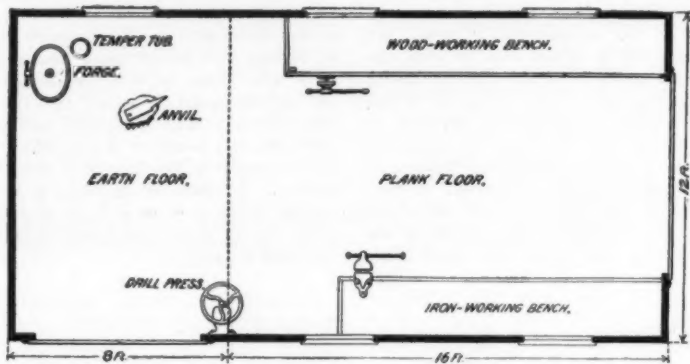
FLOOR PLAN OF WORKSHOP.
